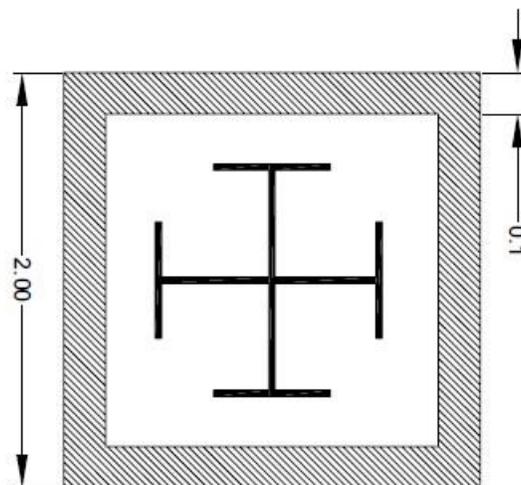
Mega column type section (2 (m) – 0.1 (m)).
